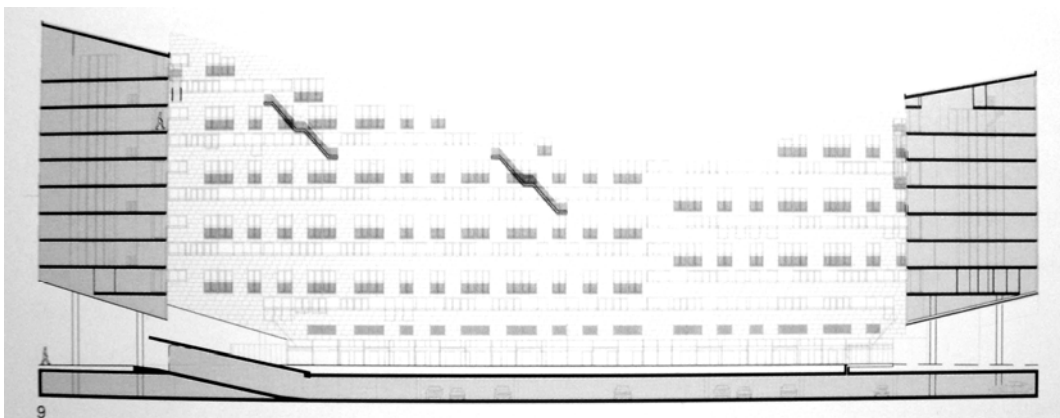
(up): North-South block section of the Whale, looking east
